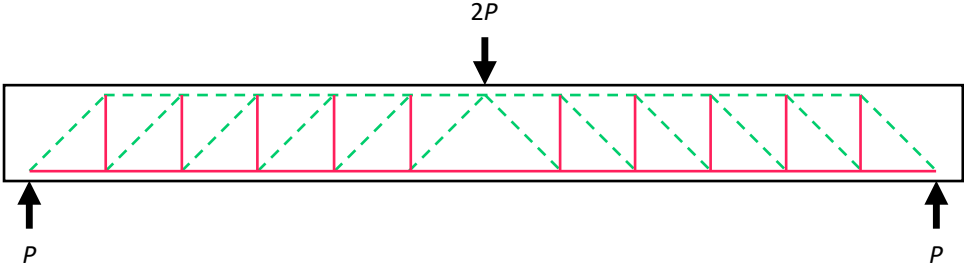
Truss analogy for the shear design of reinforced concrete
